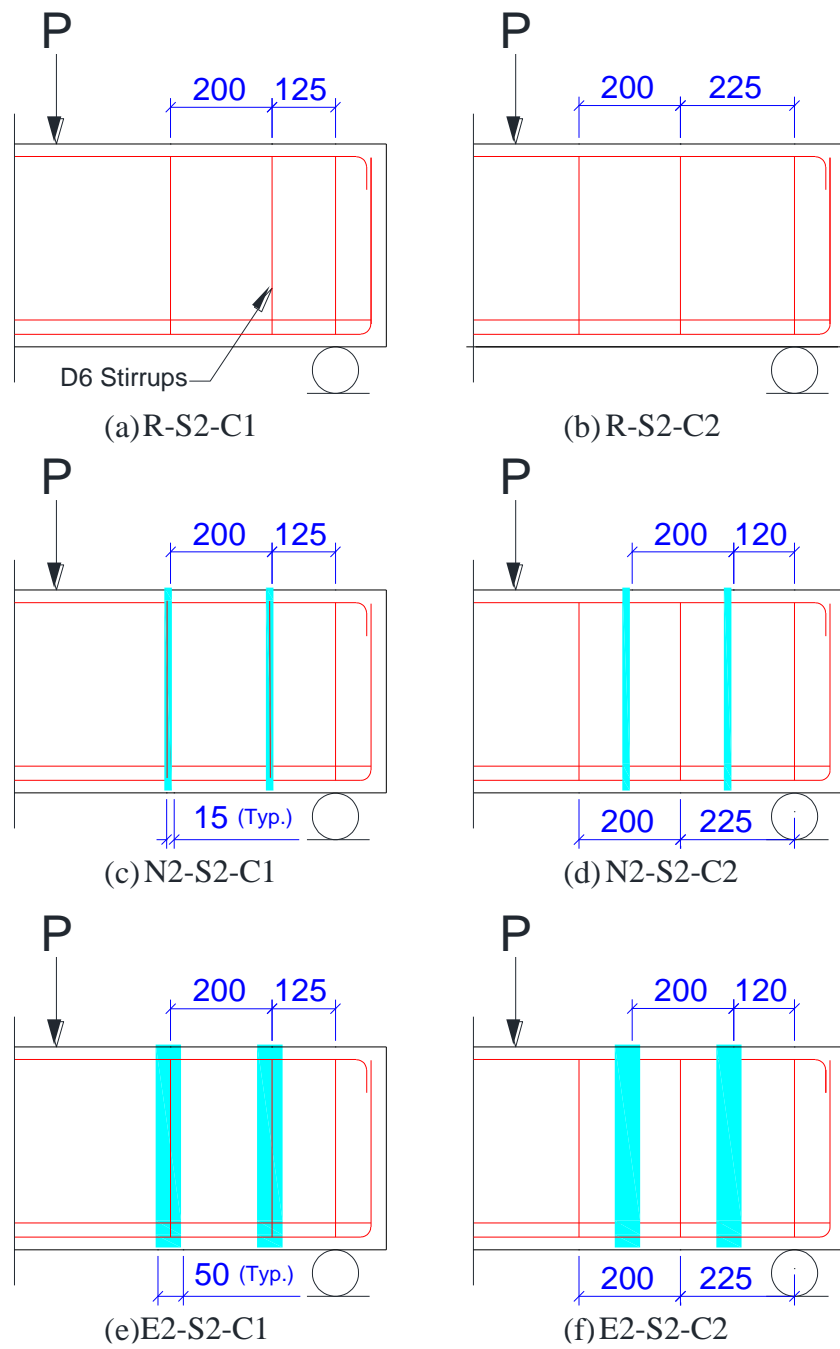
Group 2- Beam specimens with two stirrups at the CSS (Dimensions in mm).
